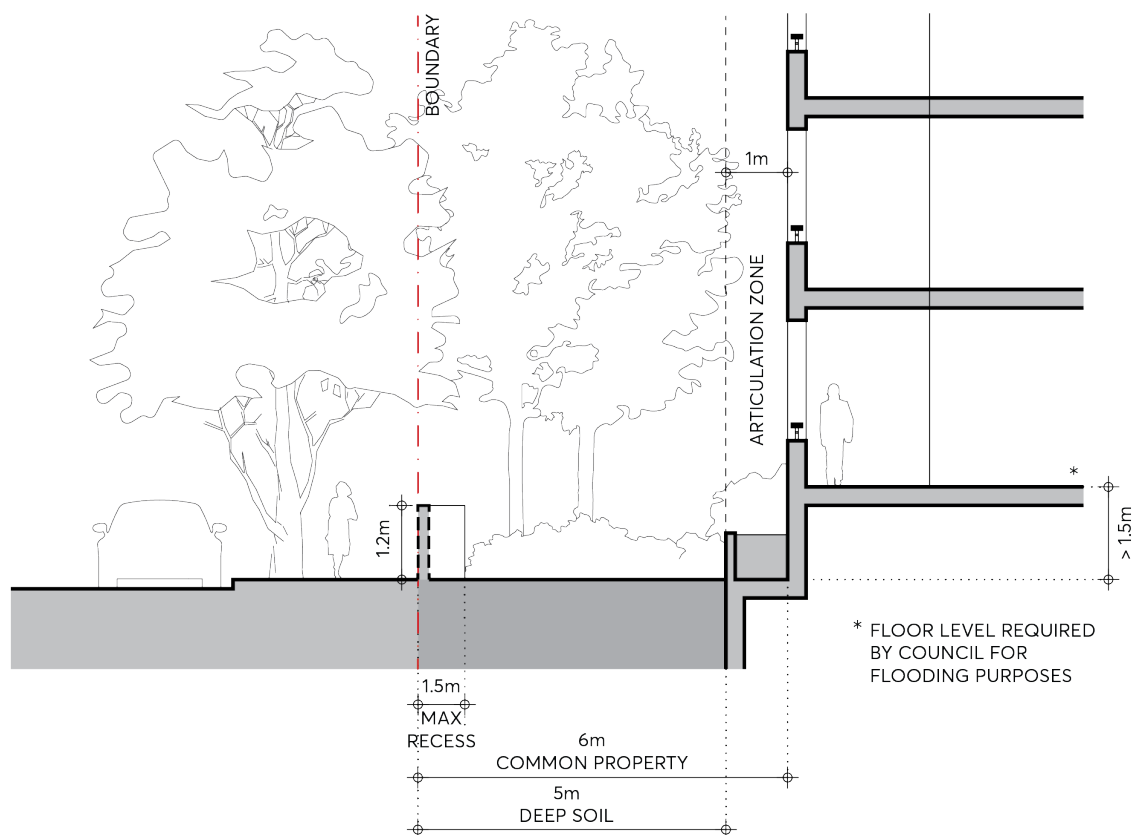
Residential Ground Floor: Floor level required greater than 1.5 metres above footpath level
